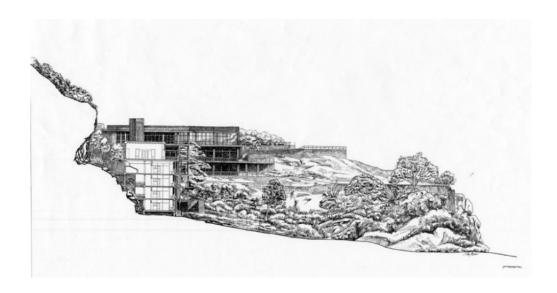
Horizontal section for Kandalama Hotel Design(*Remembering Bawa | ArchDaily*, n.d.)
